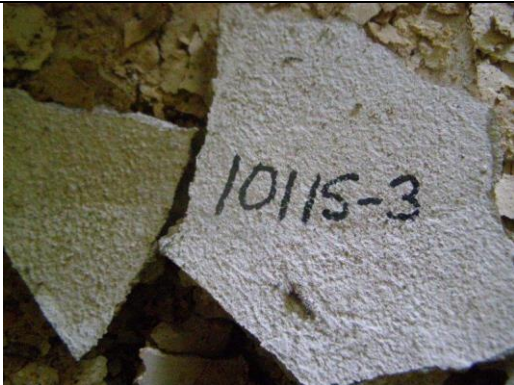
Plaster (1011S-3) Family Room, Ceiling.
